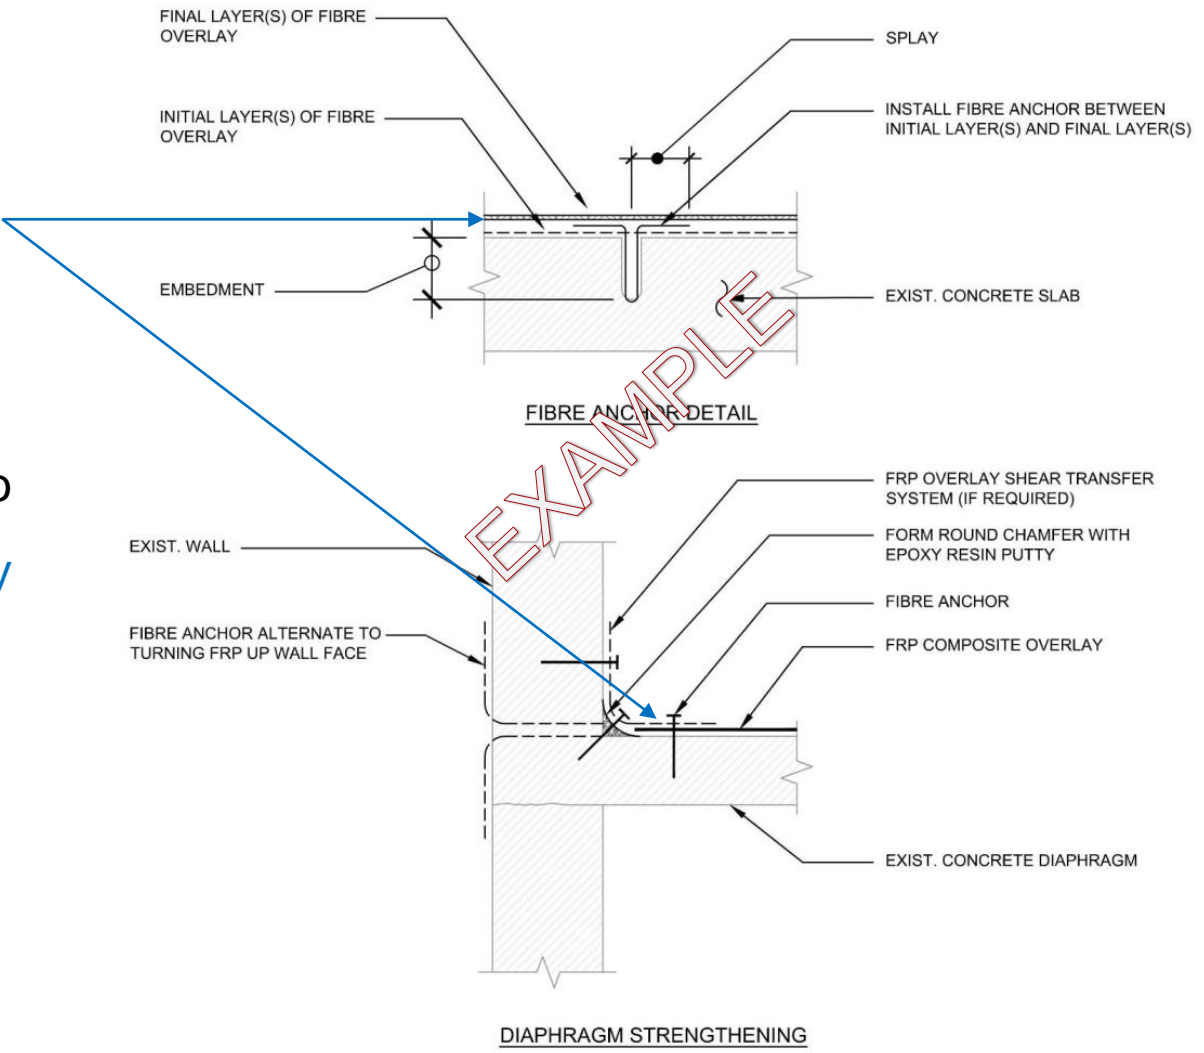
Addition of FRP overlay to concrete diaphragm
